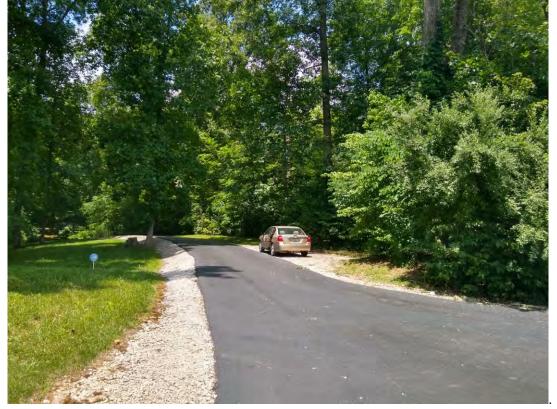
Proposed lot 1 existing driveway looking towards SFR.
